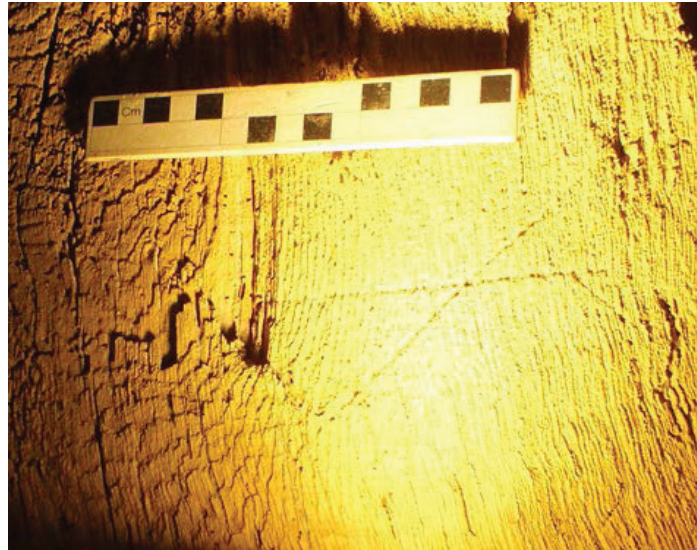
Levelling mark on the west side of the north face of Truss 4, Room 2
